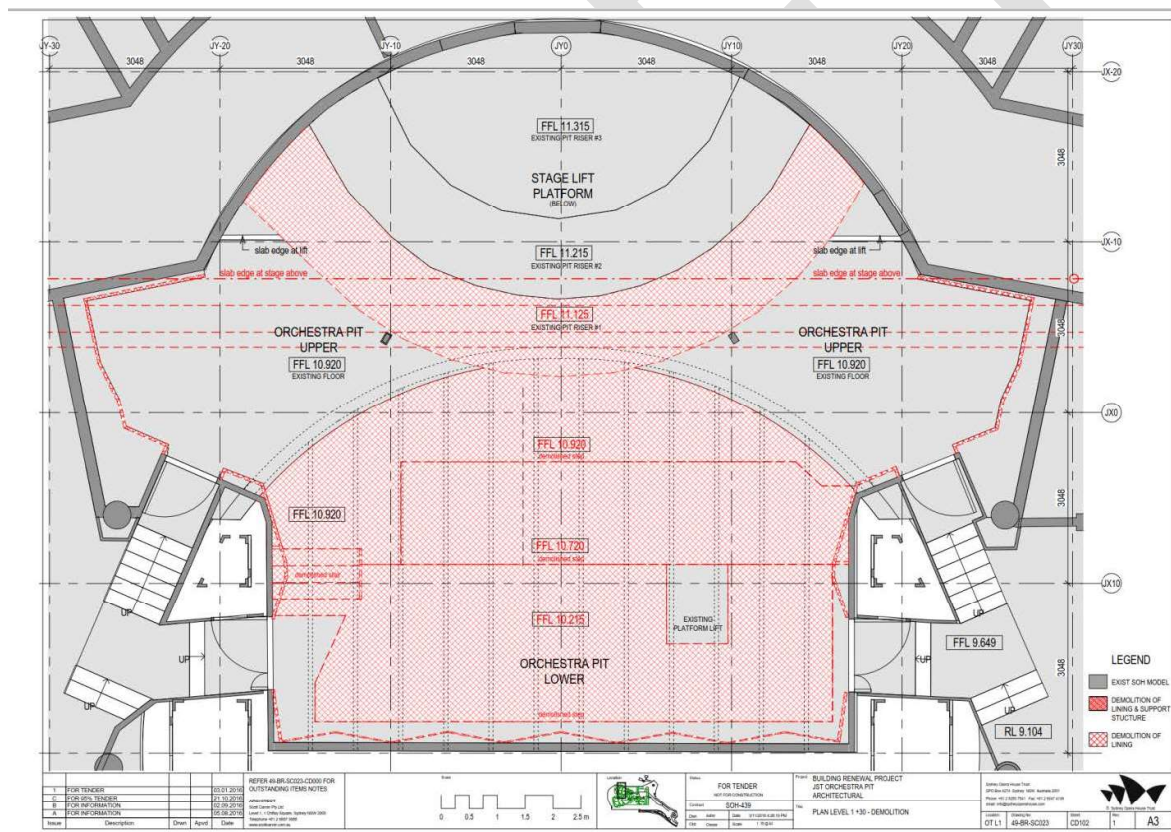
Orchestra Pit Scope of Lining and Support Structure Demolition
